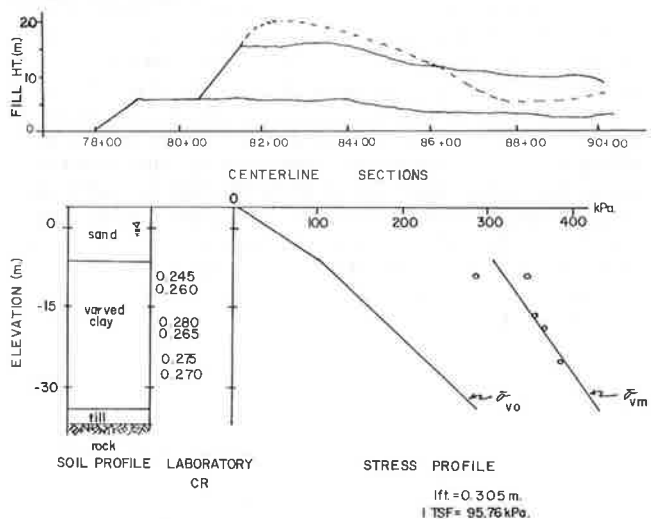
Soil and fill profile for the high fill at east approach to Putnam Bridge, site 2.
